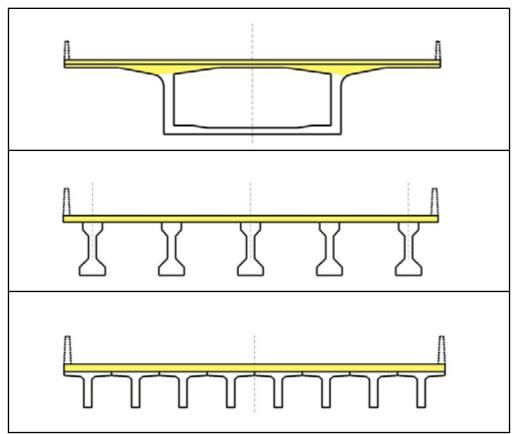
Reinforced Concrete Deck (Highlighted)
